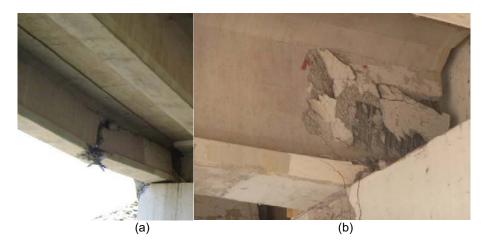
Damage at prestressed beams (a) failure of bottom flange and web of beam, (b) failure of beam. All photographs were taken at Ruta 5 Highway
